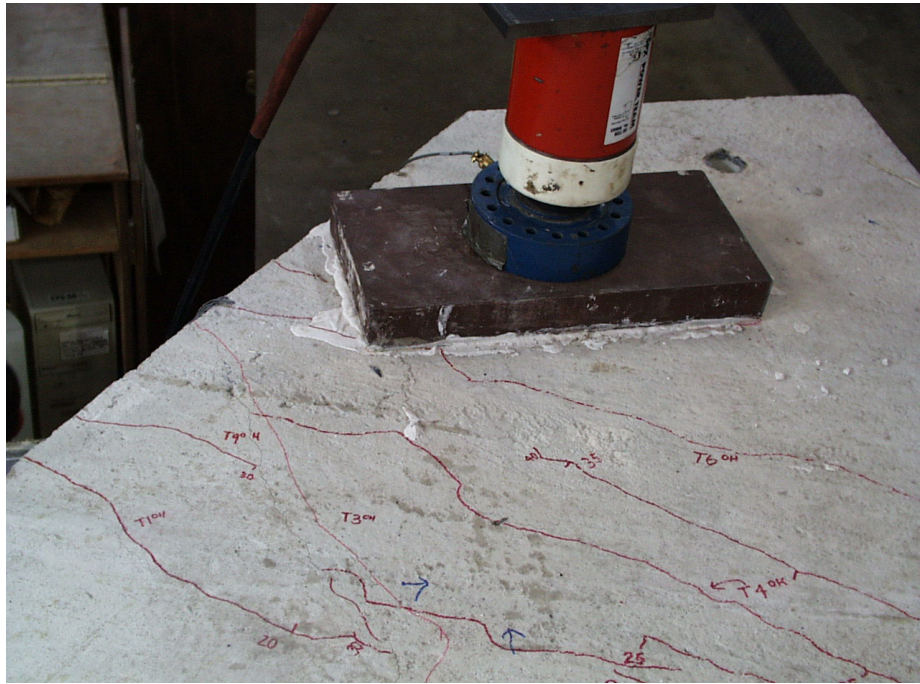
Failure of breakback IBTS overhang, top view, facing south
